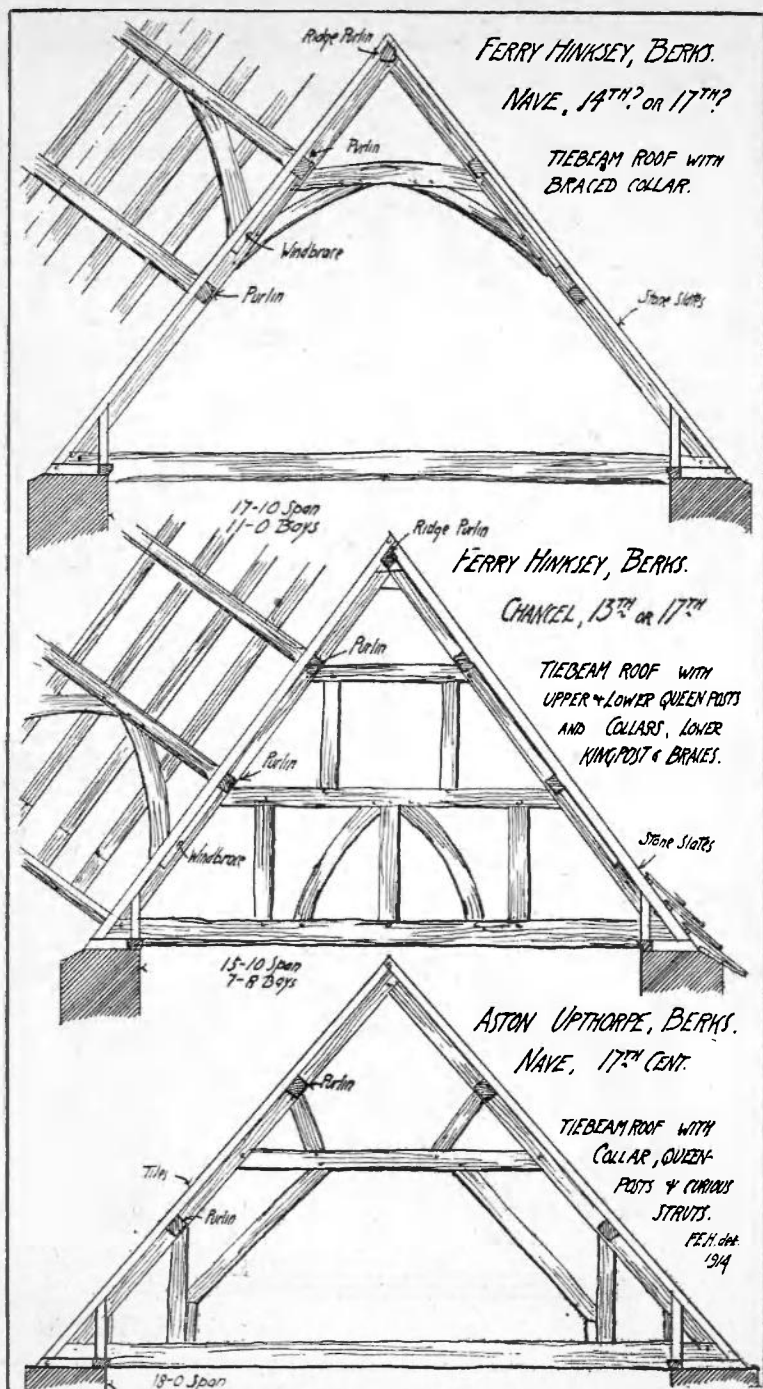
TIE-BEAM ROOFS WITH COLLARS OR QUEEN-POSTS.
